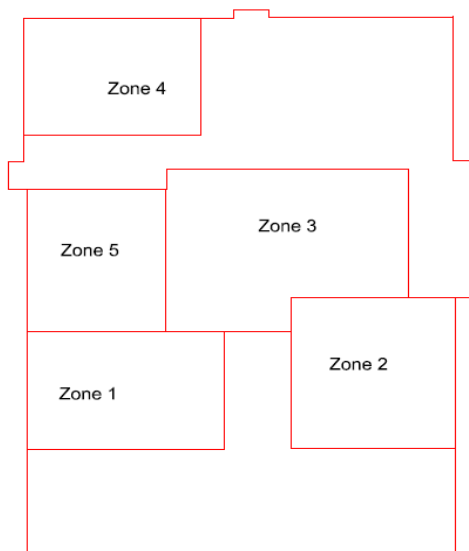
Single line diagram of the above floor plan Indicating Zones Under Study
